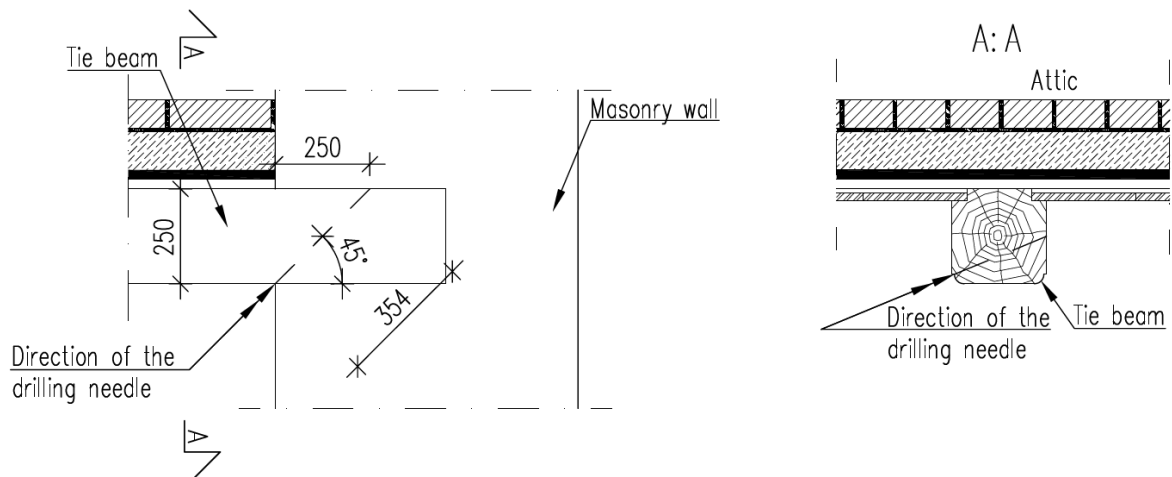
Schematic drawing how the resistance drilling was performed to the tie beams in the third floor. The post and the rafter connect to the tie beam inside the masonry wall even though it is not presented in this figure.
